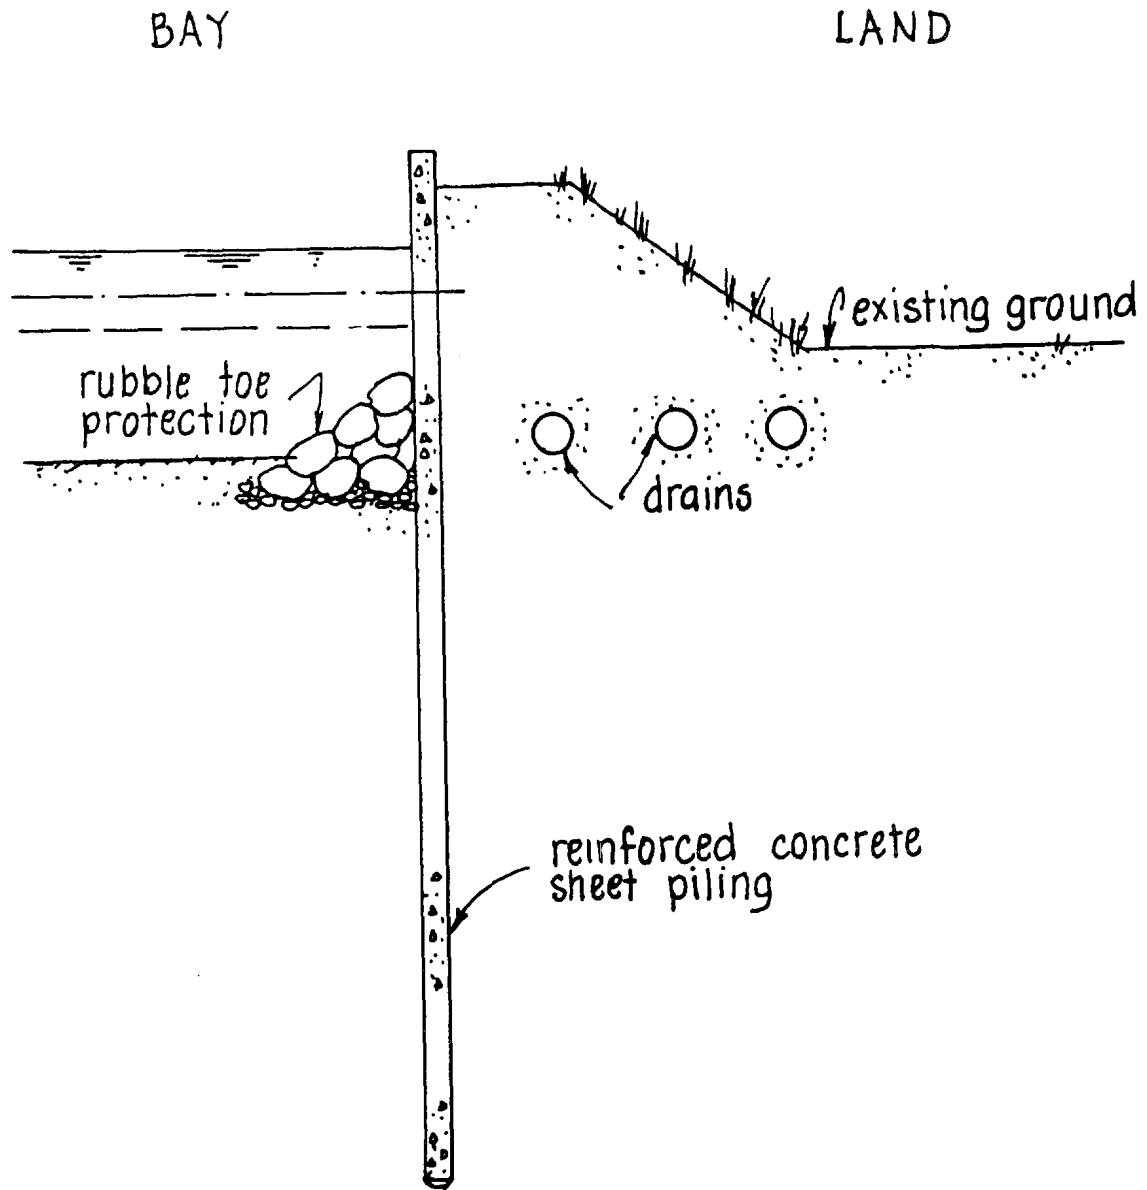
Typical Cross-Section for Concrete Sheet Pile Bulkhead/Dike.
